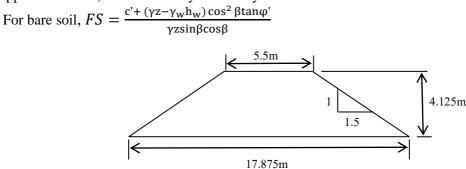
LGED rural road section through hills, Road Type B (LGED, 2005)
